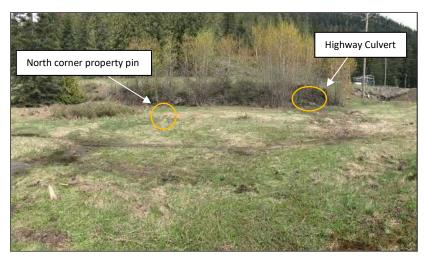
Location of highway culvert and north corner of the property (May 10, 2023).
